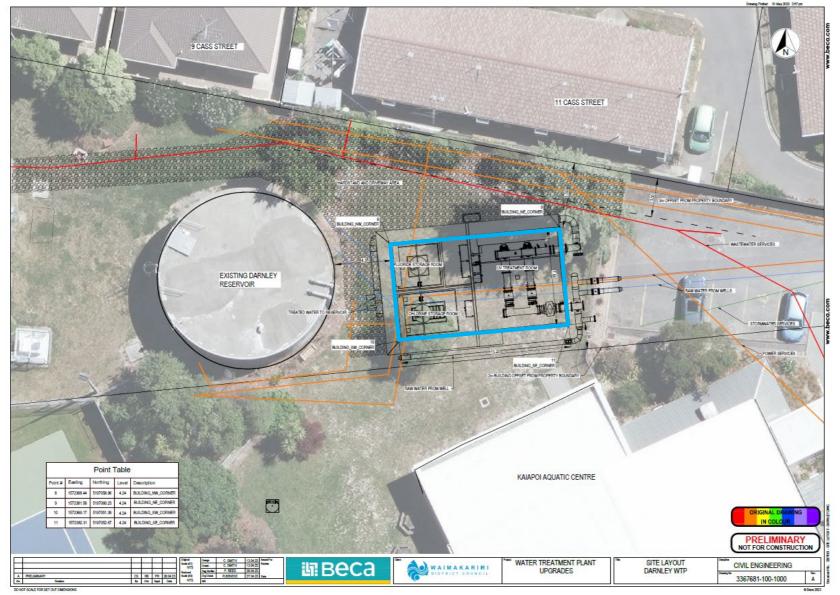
Proposed Darnley Square Site Layout (blue line represents building outline)
